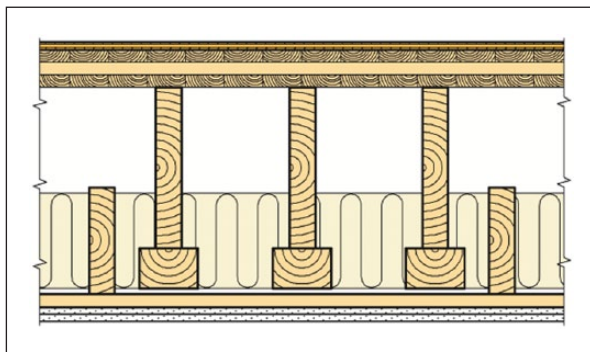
Common type of Swedish wooden joist constructions: type A, hybrid CLT and wooden joist construction, FS-CN.
